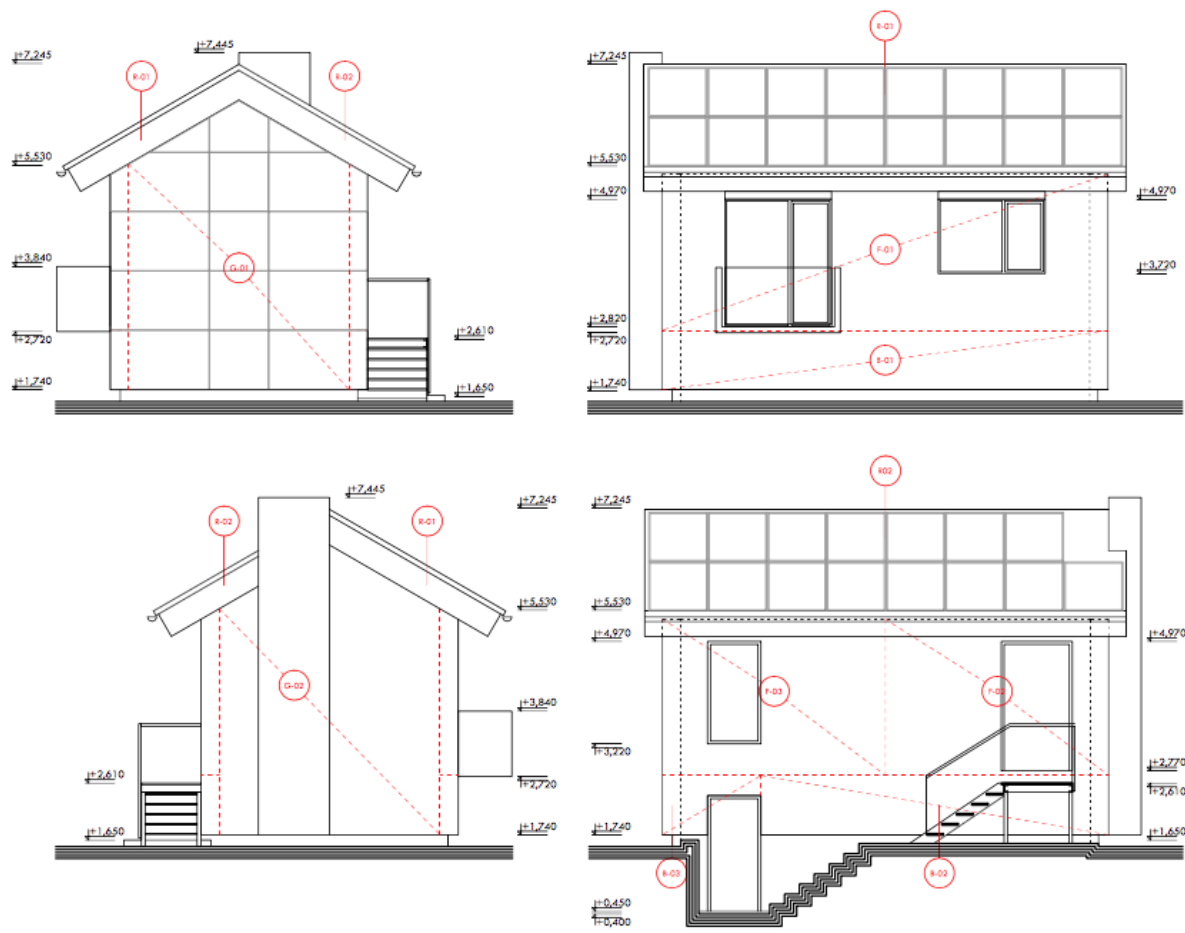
Elevations showing modules that will be included in the testing. In addition to that HVAC system will be mounted in the semi-underground floor.
